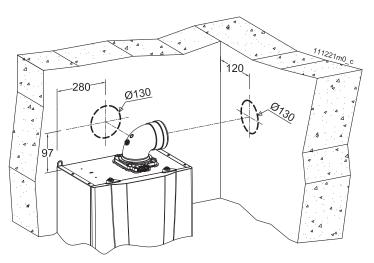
Measurements and centre space distances for coaxial exhaust preinstallation hole
